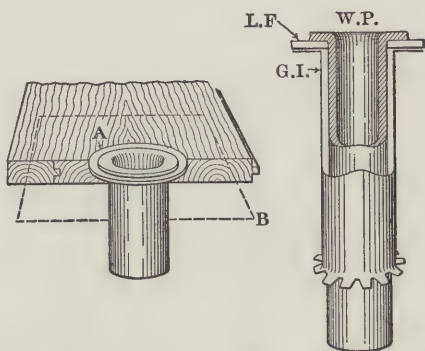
FLOOR WASTE WITH CARDBOARD UNDER FLANGE TO PROTECT FLOOR WHILE WIPING THE JOINT
